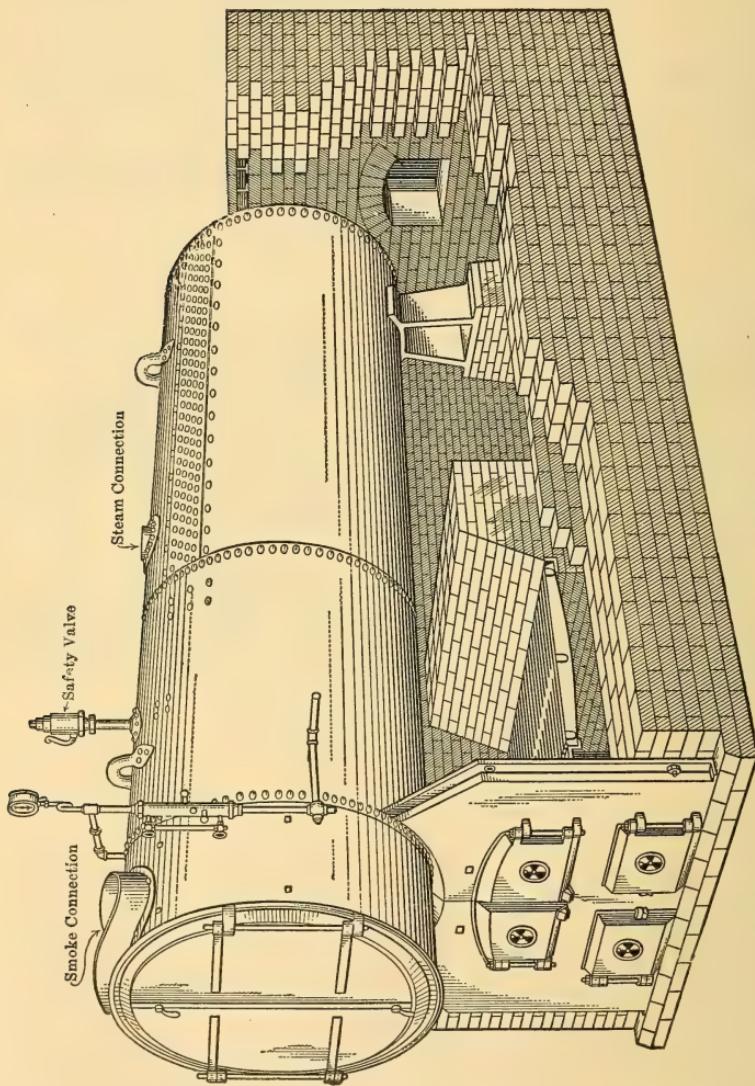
Horizontal Return Tubular Boiler with "Half Front."
